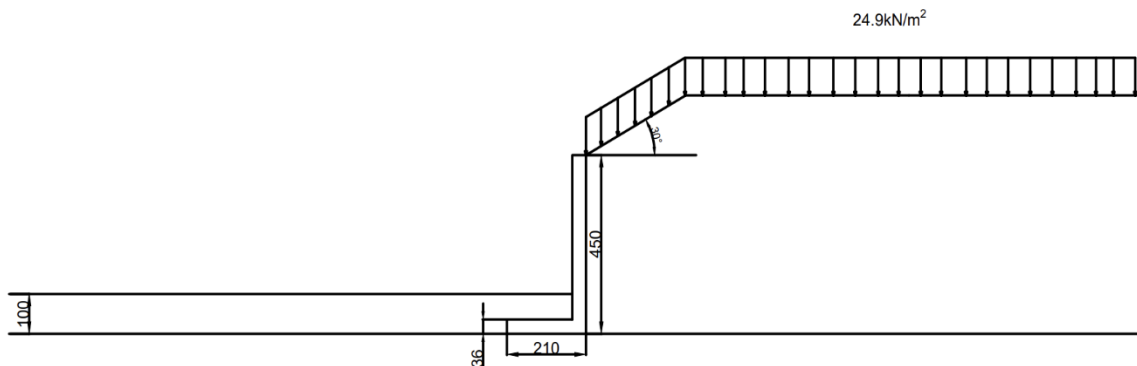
Geometry of retaining wall with backfill slope 30°
